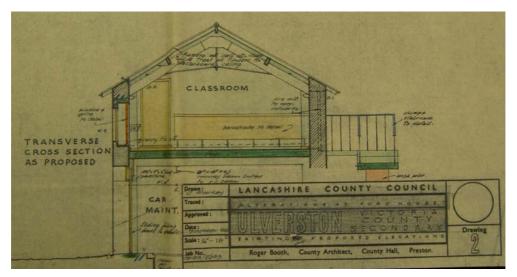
Coach House transverse cross section as proposed in 1966 (BDB 33/12/9 1966-9)
